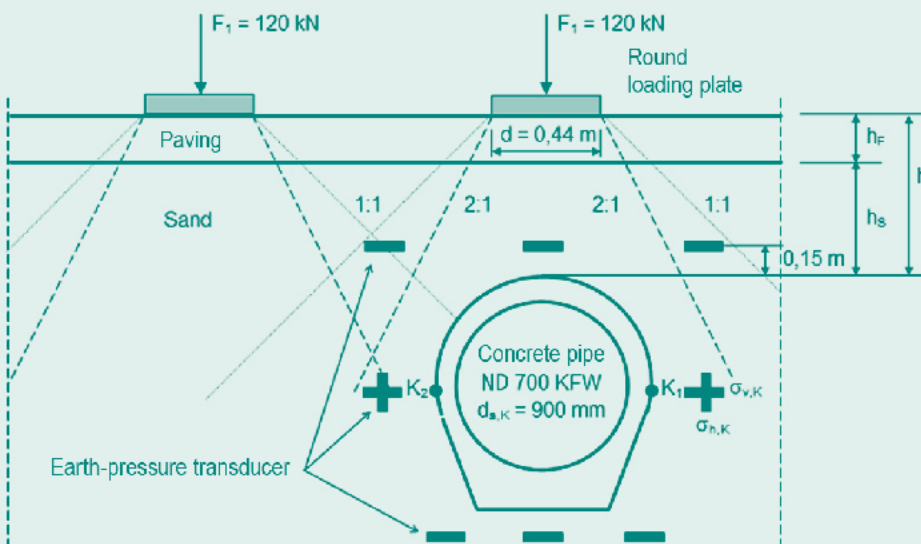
Spread of load over the ND 700 concrete pipe KFW, normal load position (to scale for $h = 0.88$ m)
